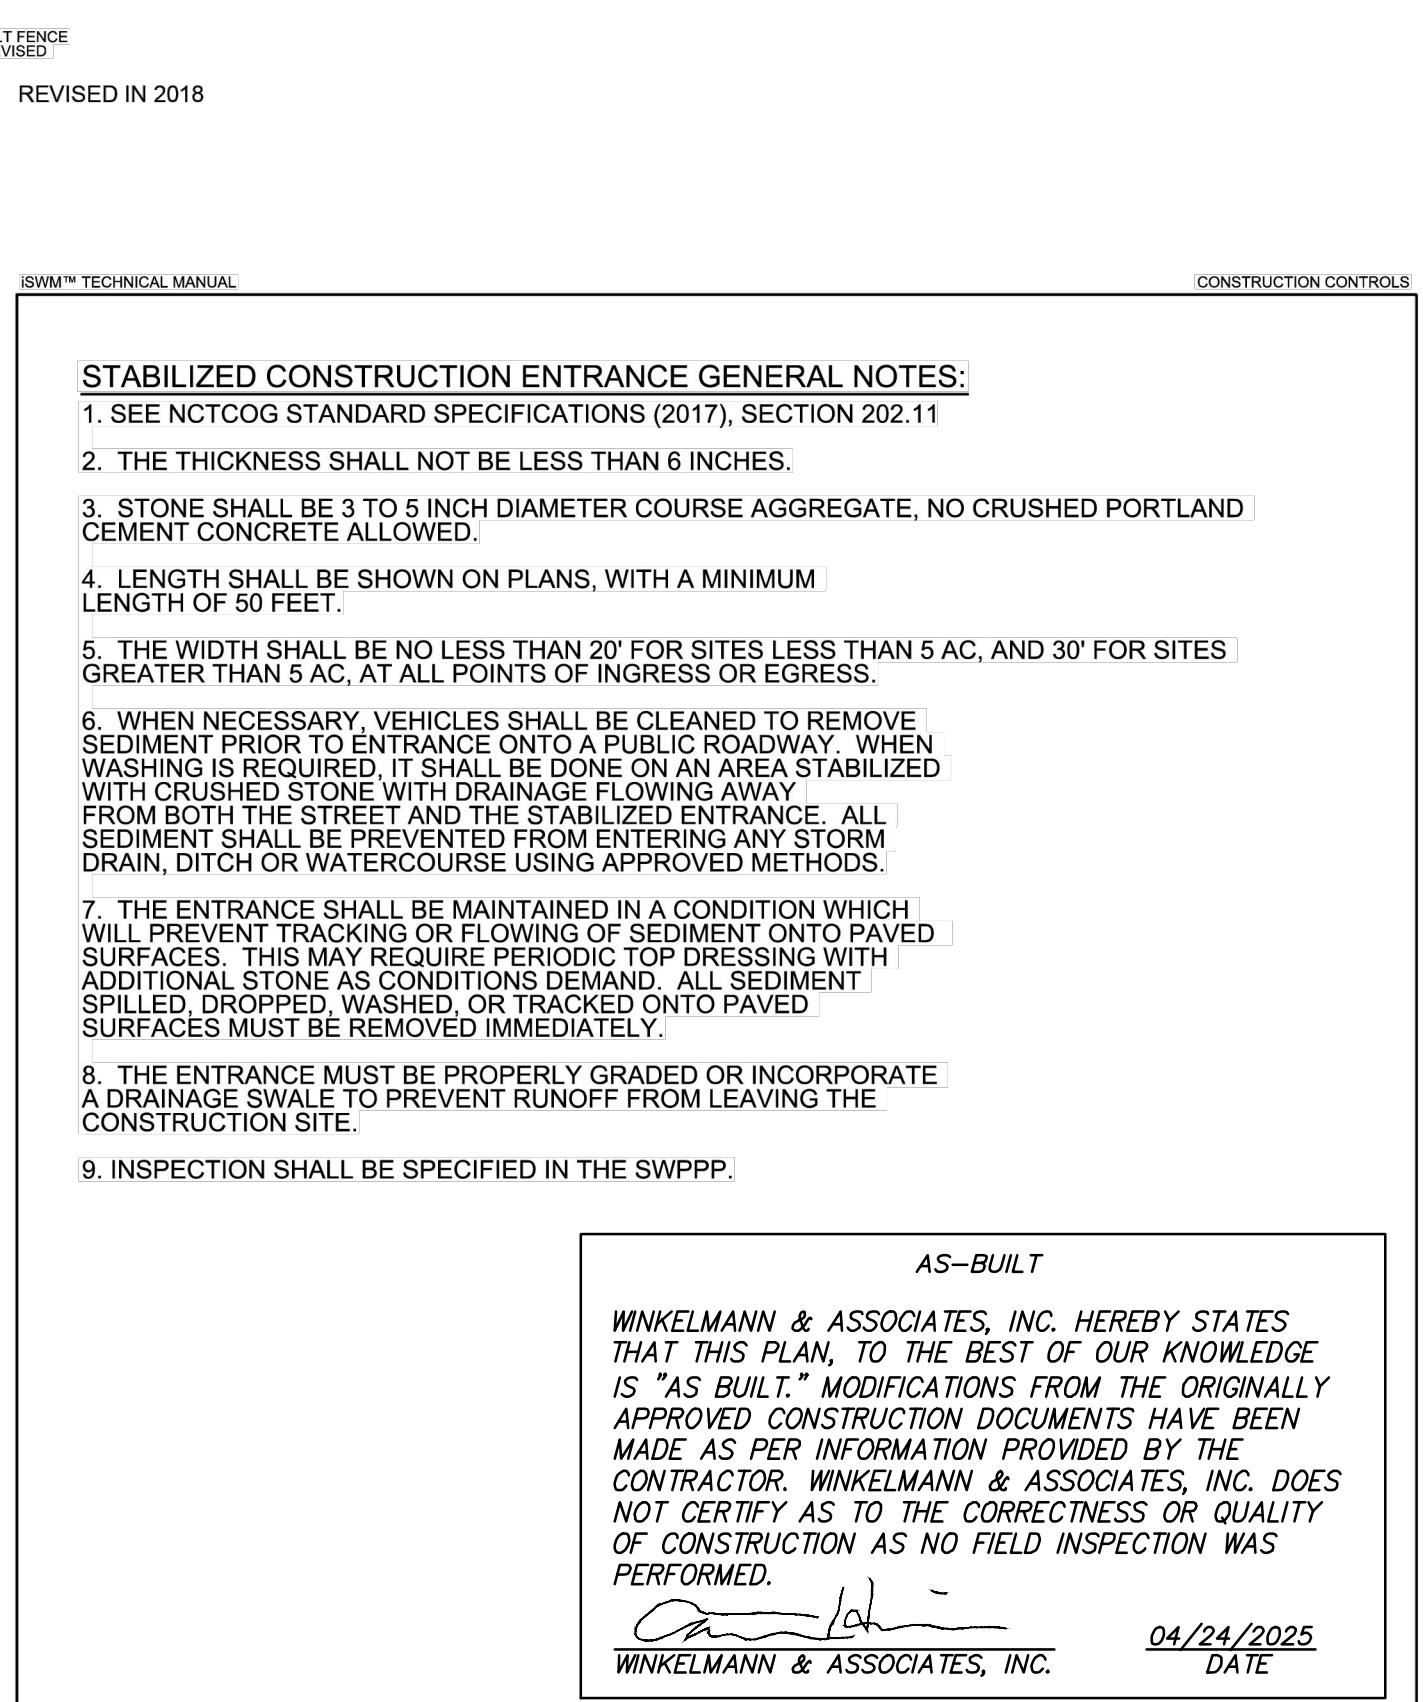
NOTES FOR STABILIZED CONSTRUCTION EXIT (2 OF 2)
